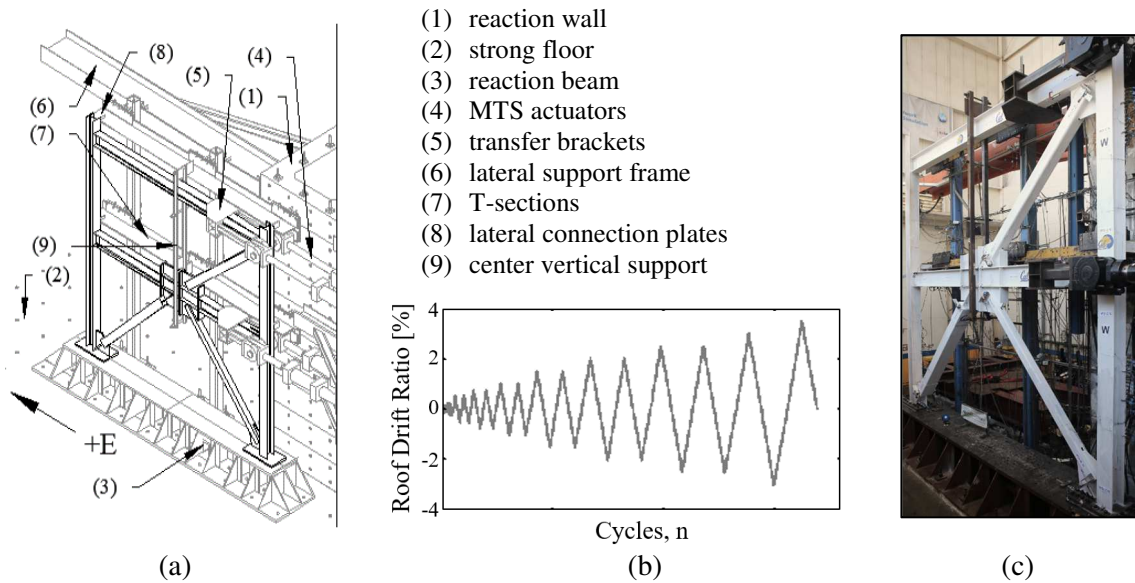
(a) Test setup, (b) Loading protocol, (c) Constructed test specimen.
